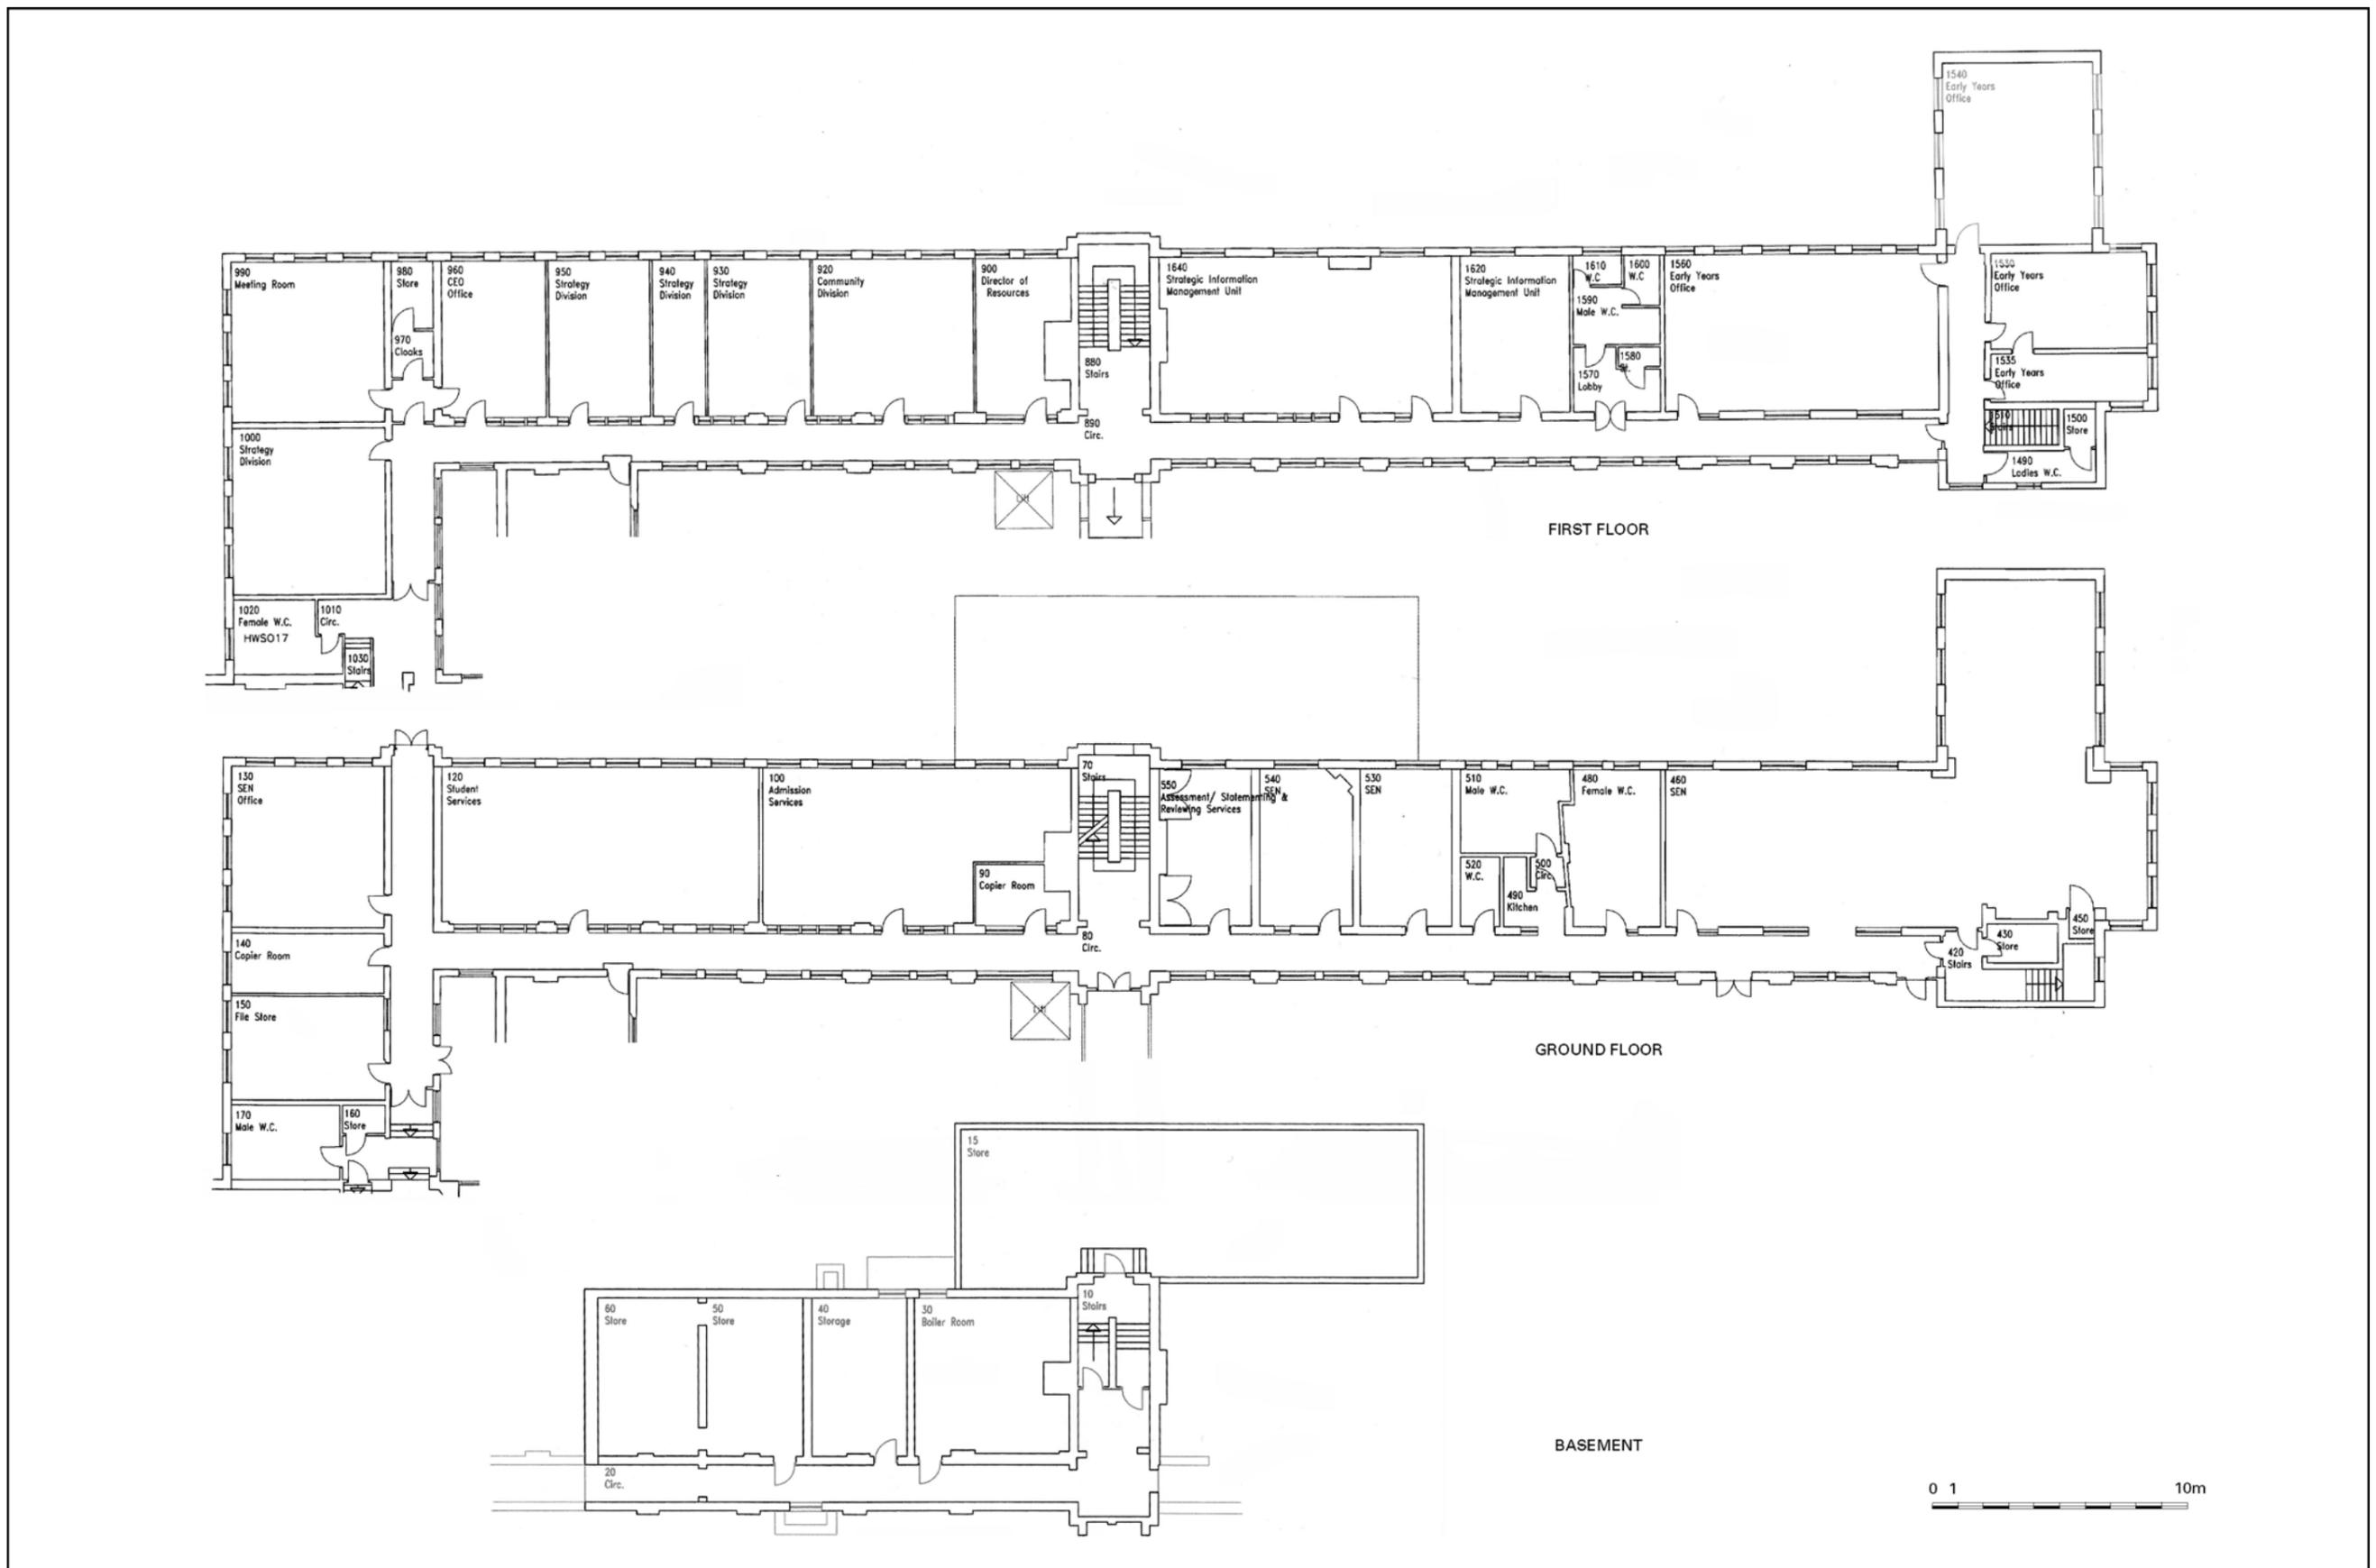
12 Northgate Street (offices at rear of east side), floor plans
